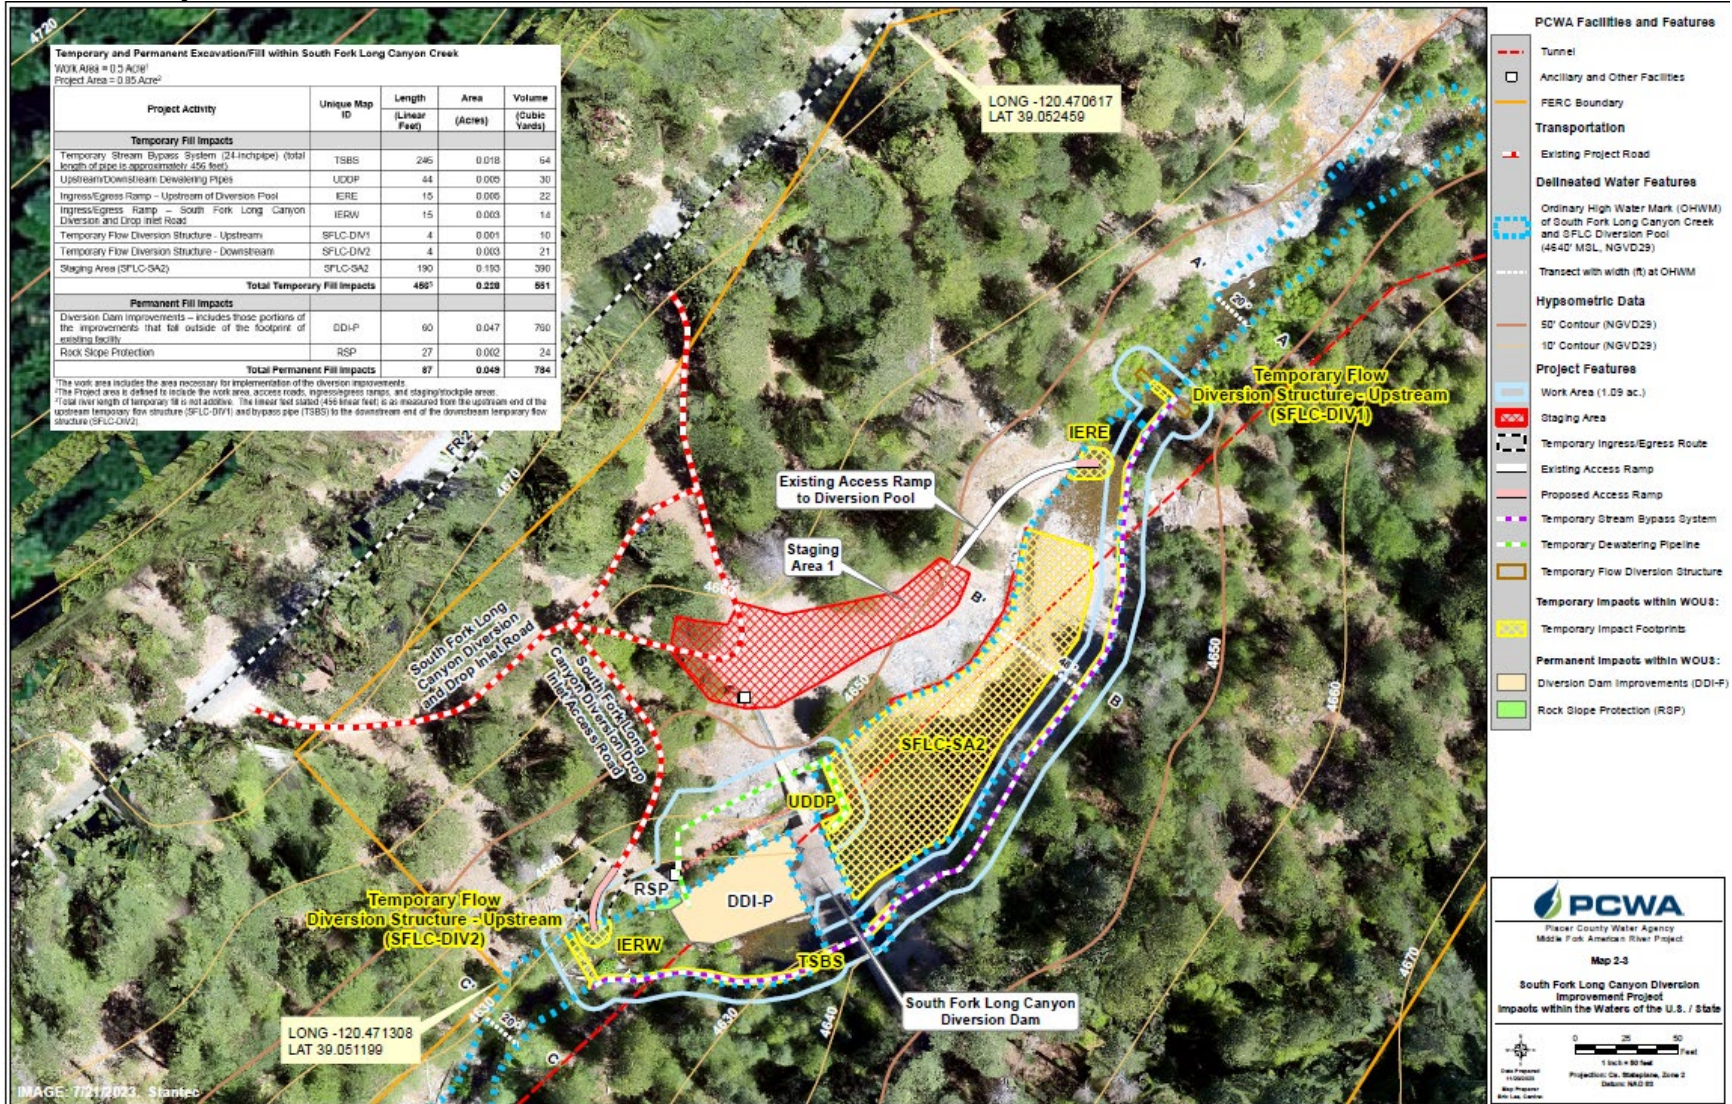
Aerial View of South Fork Long Canyon Diversion Improvement Project Work Area (PCWA 2023)
